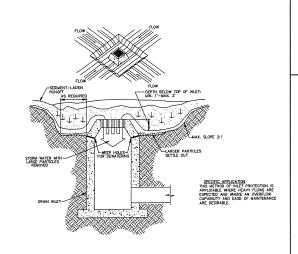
EXCAVATED INLET SEDIMENT TRAP N.T.S.
